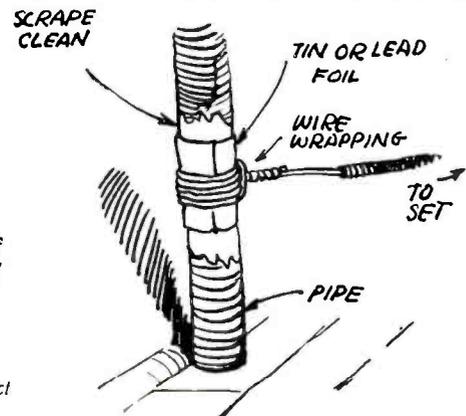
This arrangement shows how to make an efficient ground connection, when water pipes are used.
